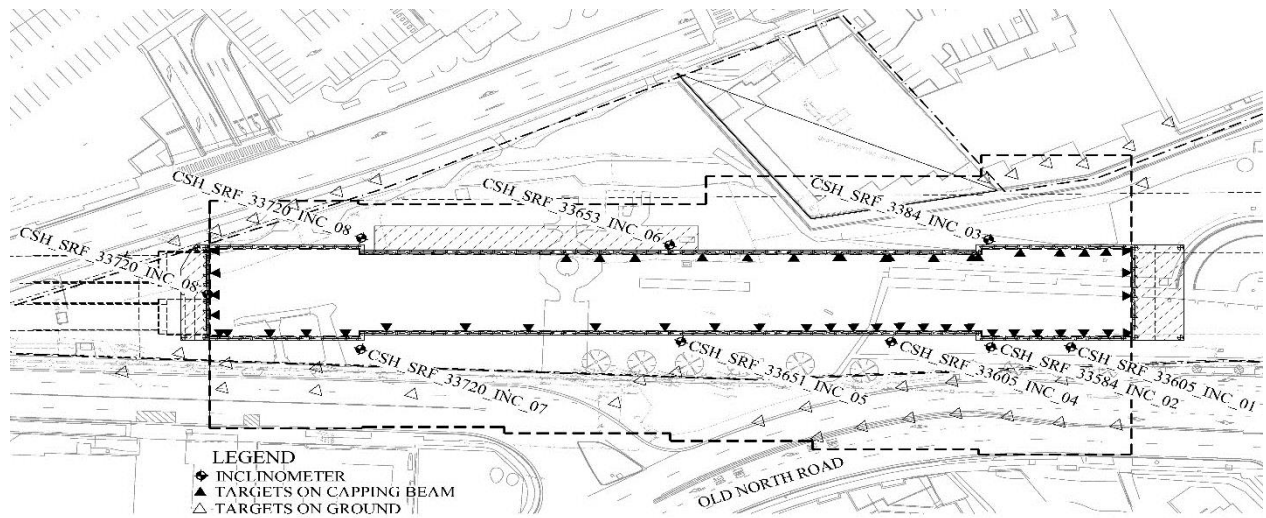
Plan of monitoring locations on wall, capping beam and pavements
